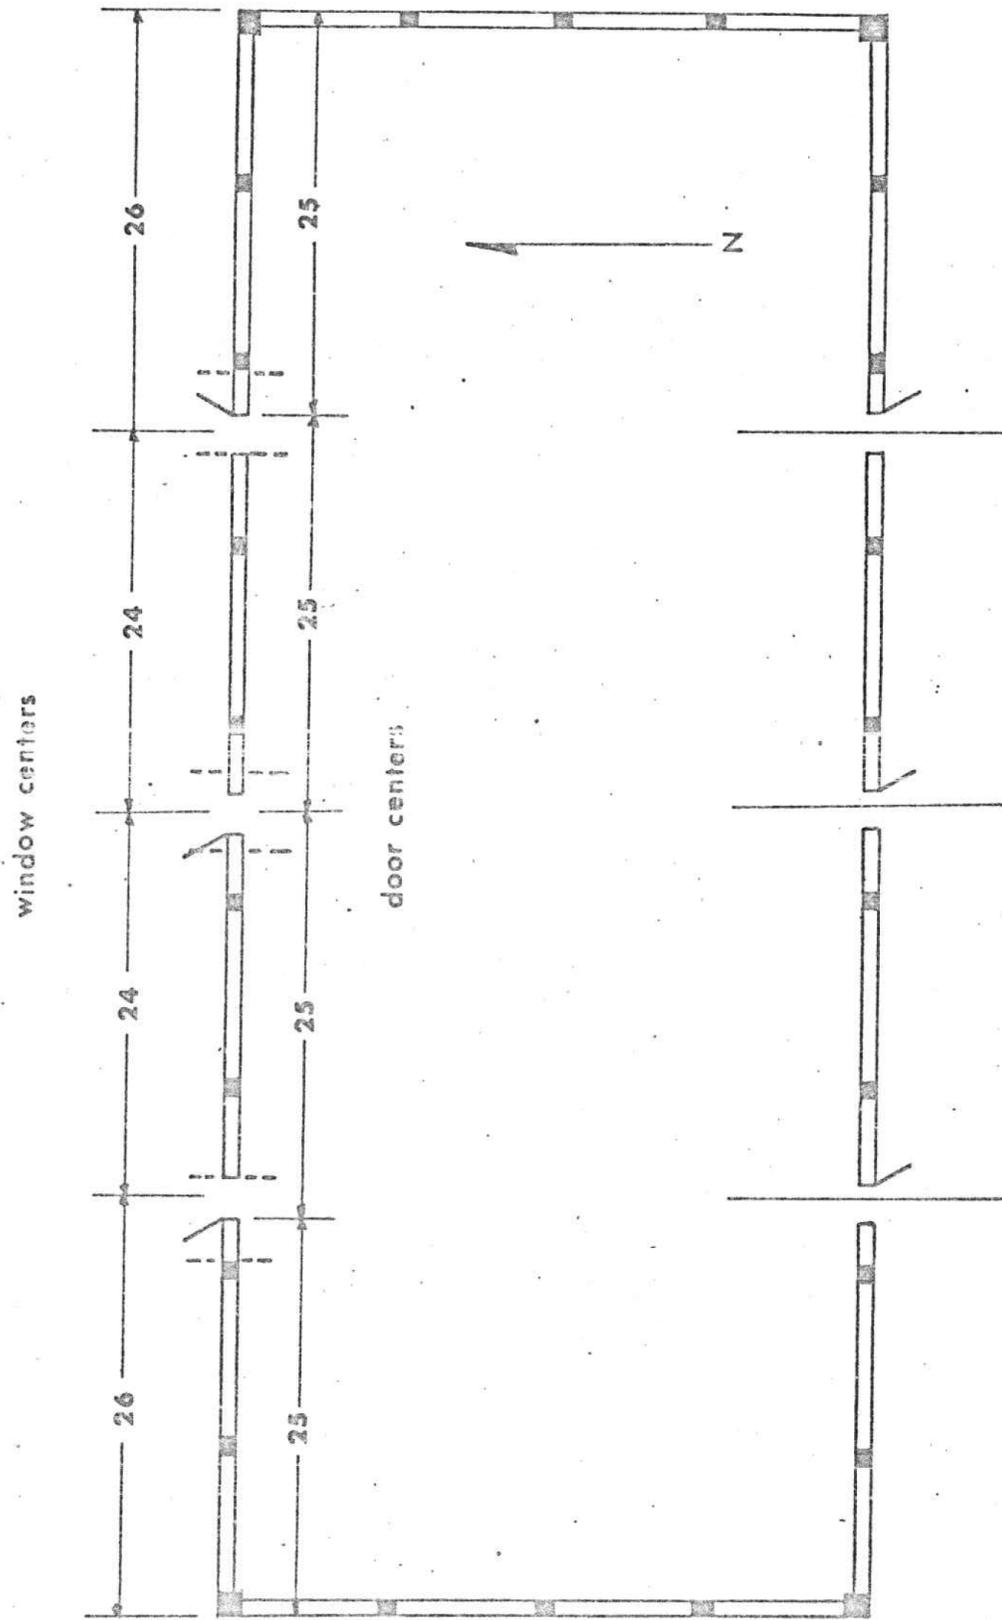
Suggested window positions at the second floor of the Fur Store.
